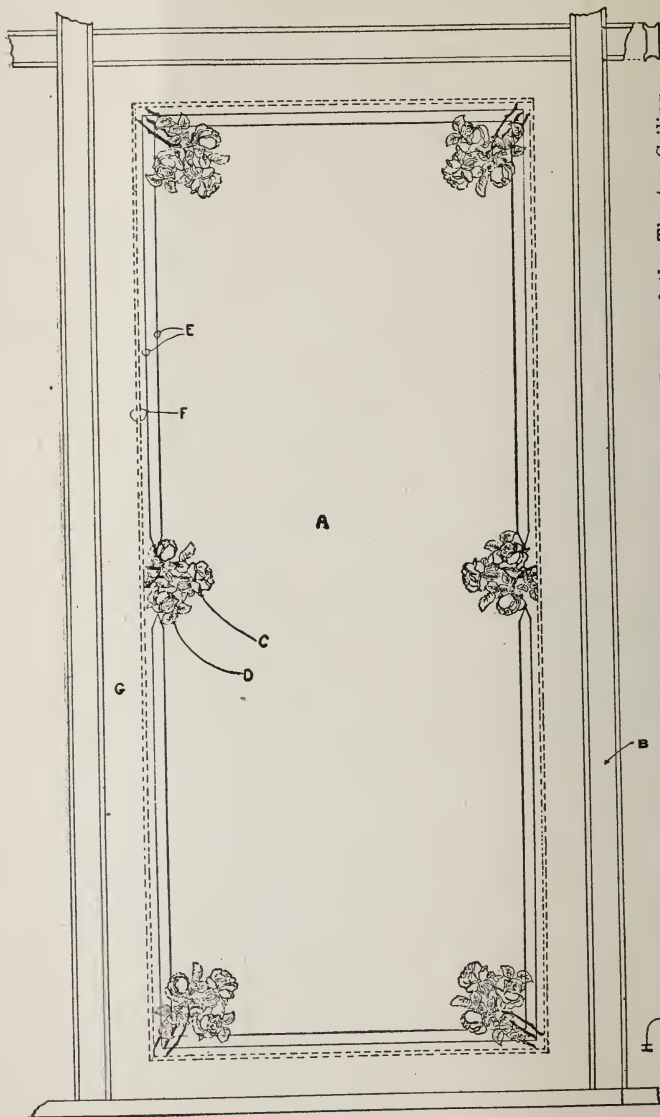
A Single Panel Within the Beams of the Theater Ceiling
